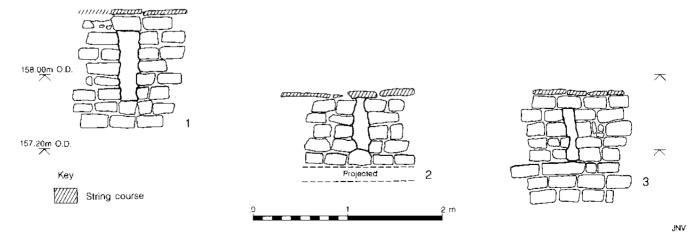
Schematic elevations showing slope compensation in the north (2) and south (3) walls of Building 197 and the south wall (1) of Building 198
